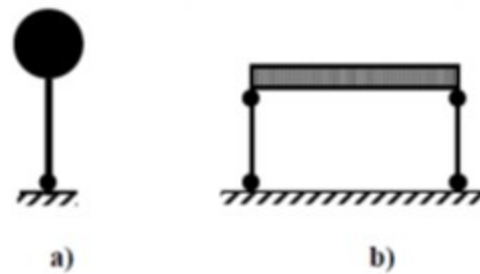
Inverted pendulum: a) dissipative zones at the column base; b) dissipative zones in columns ($N_{Ed,G}/N_{pl,Rd} \geq 0,3$)
